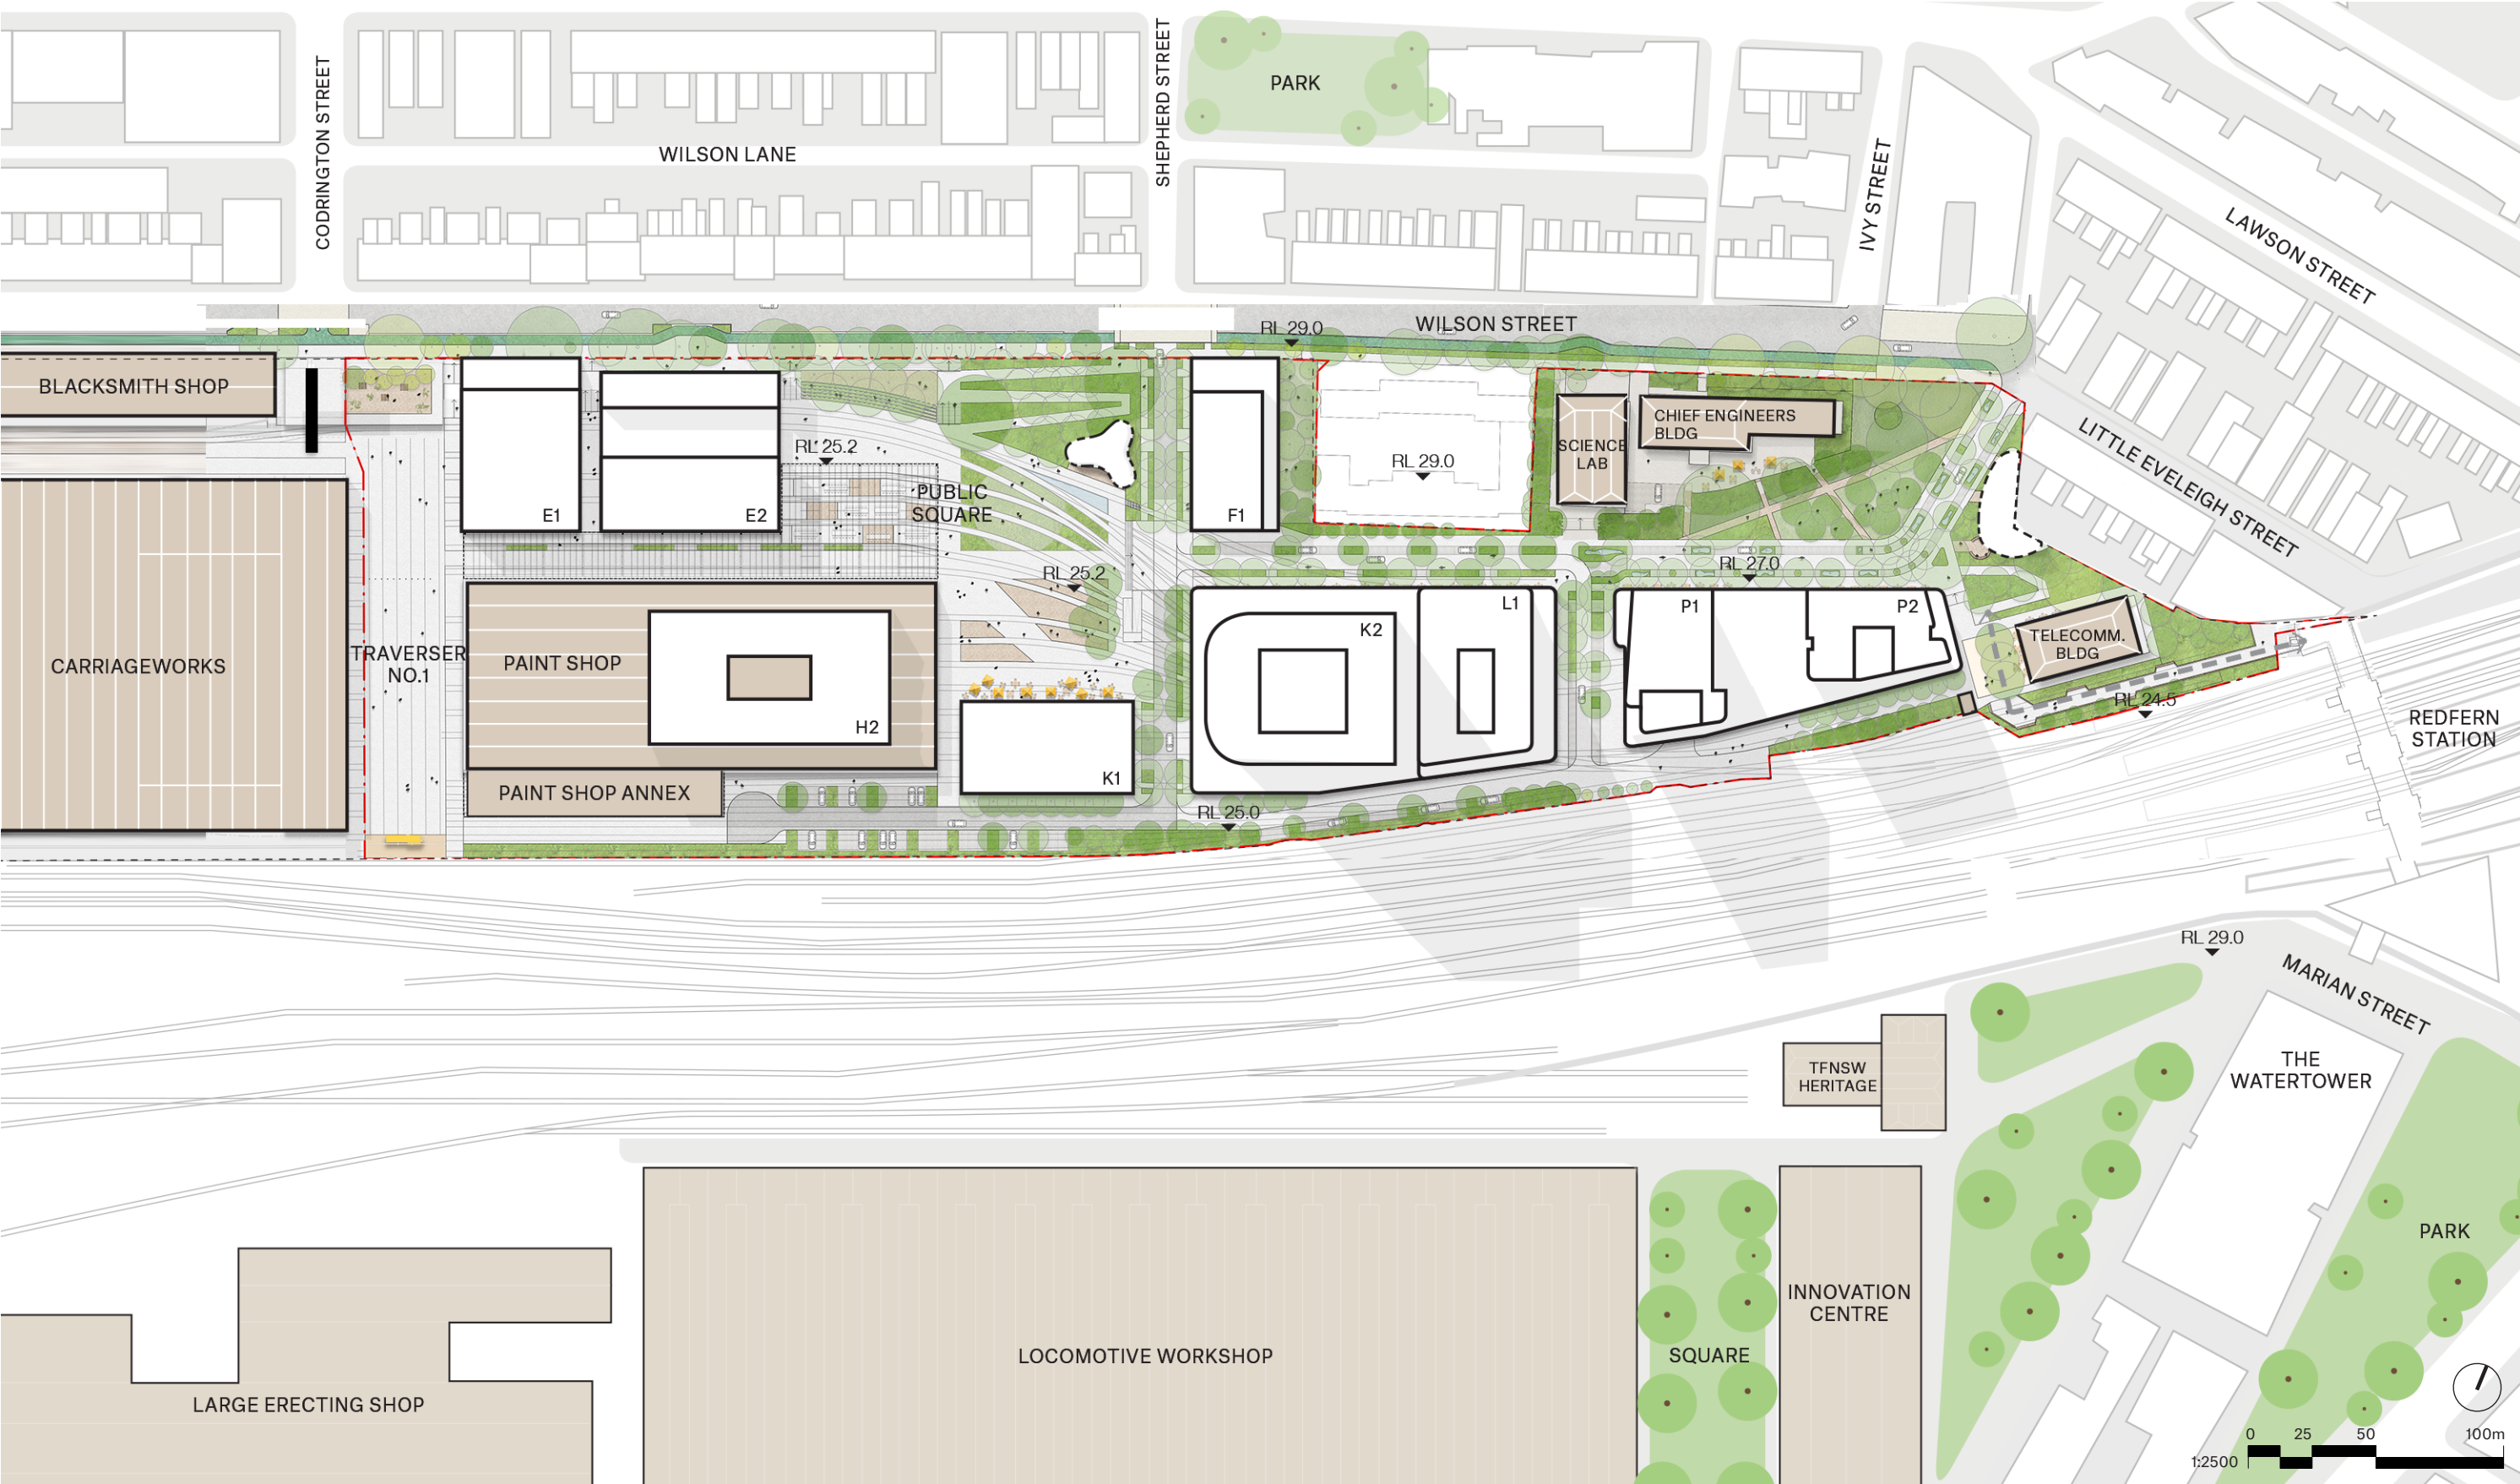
Illustrative plan of proposed masterplan
